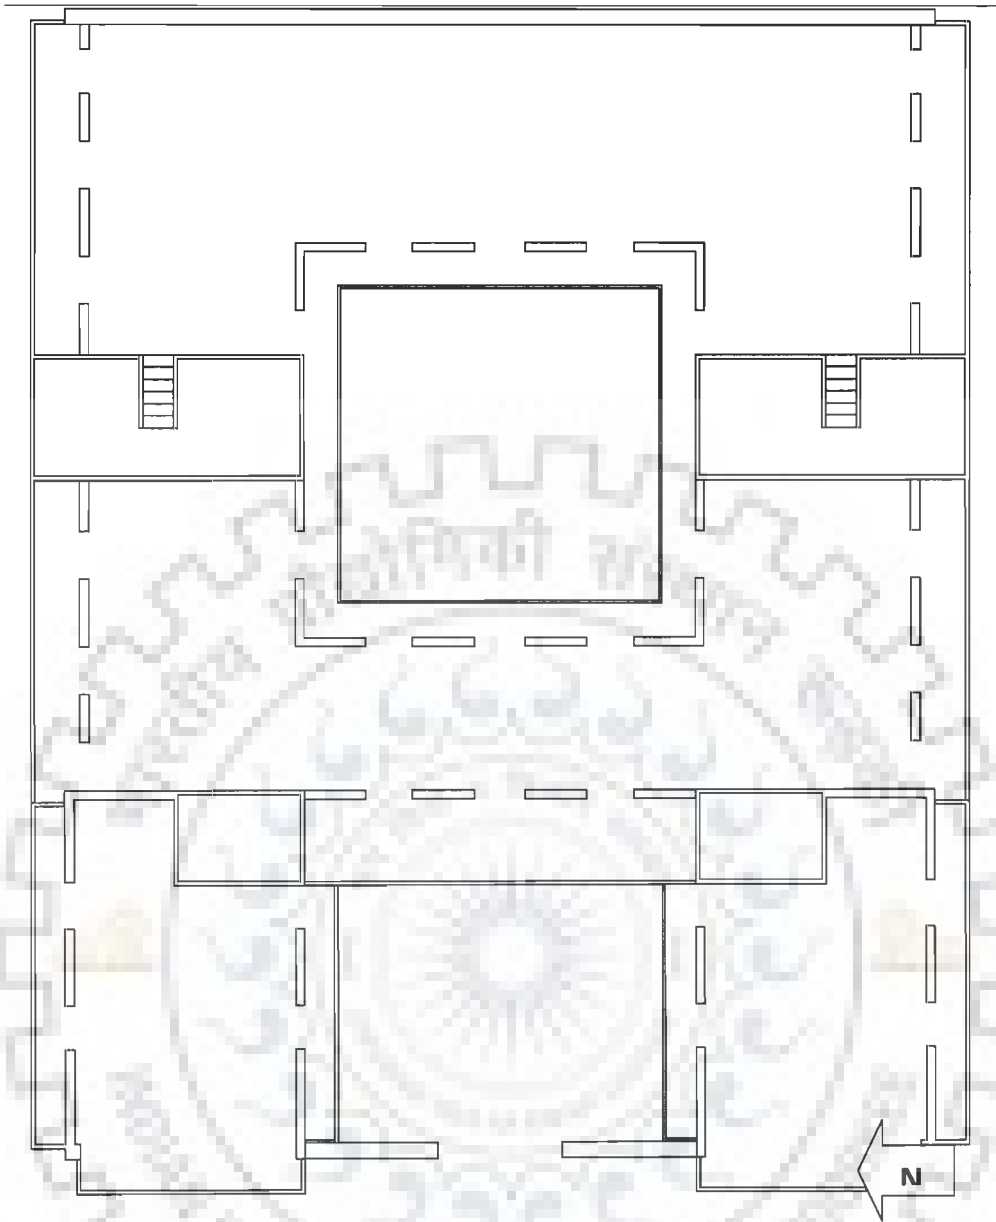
Mezzanine Floor Plan for Upper Ground Level
